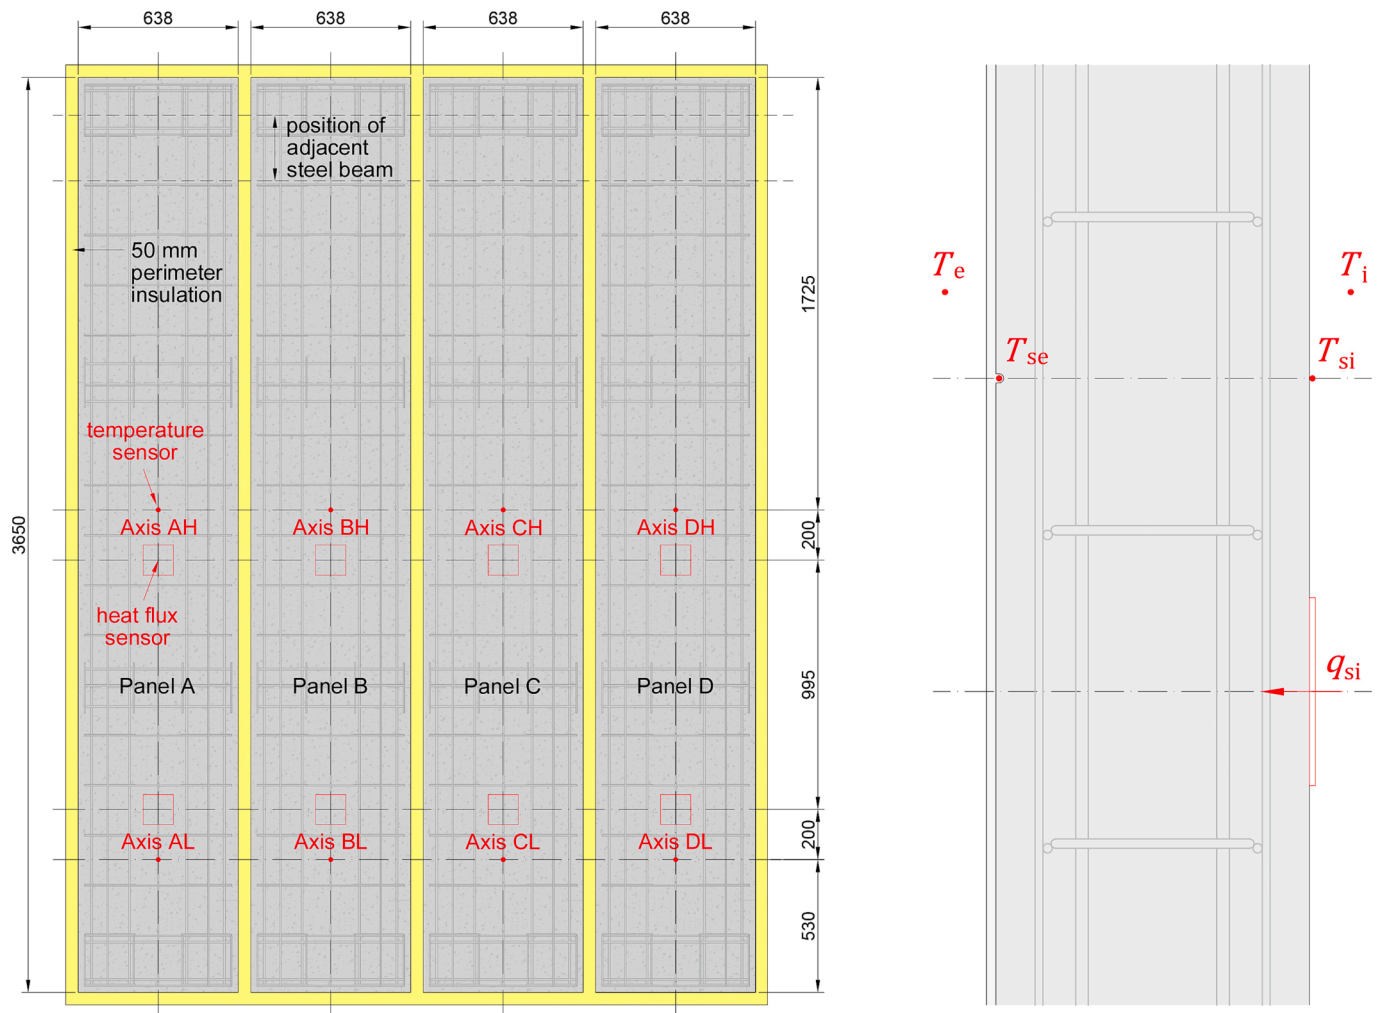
Location of monitoring devices within internal elevation (left) and vertical section (right).
